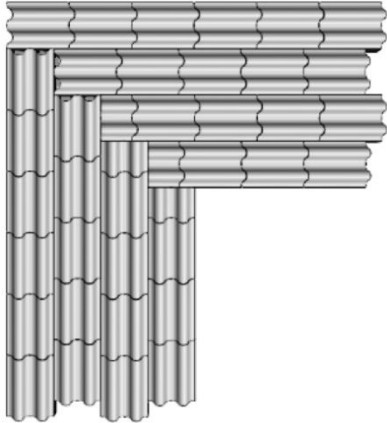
How to begin masonry of a high-density concrete block wall. Always follow the instructions provided by the designer of the building or structure!
